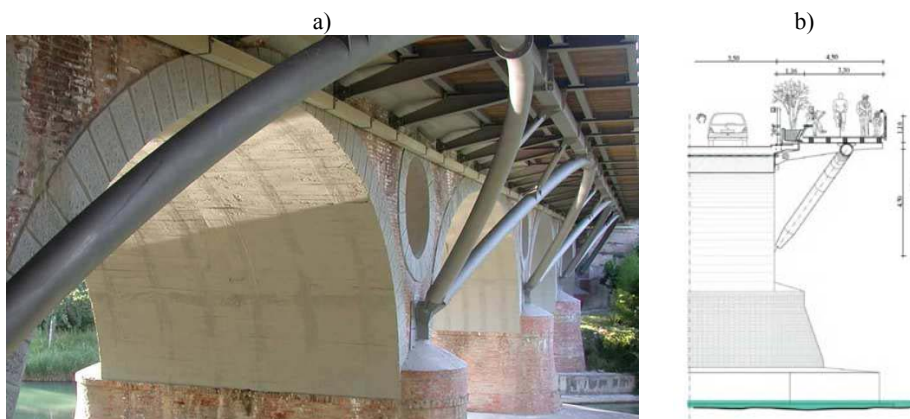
Steel construction for unloading the brick vault of the viaduct. Division for assembly parts in the range of one span.
